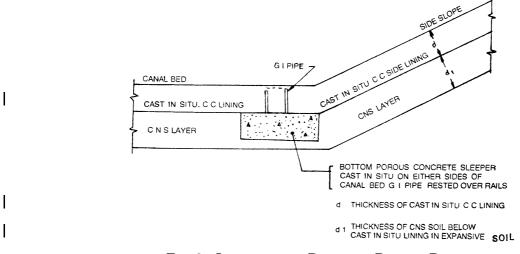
ILLUSTRATORY DETAIL OF BOTTOM RAILS
